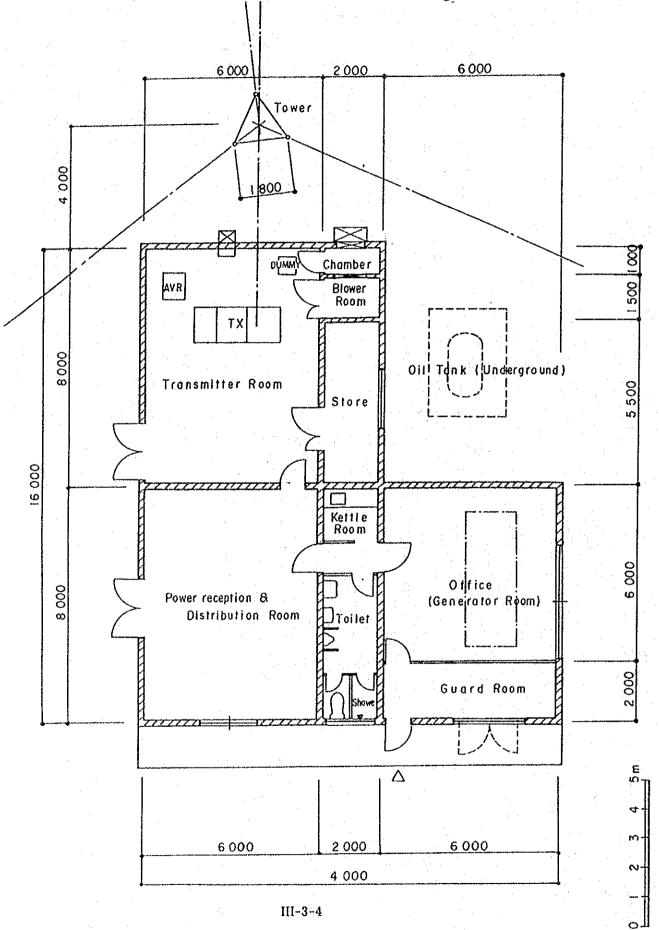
Floor Plan of Asuncion Transmitting Station
